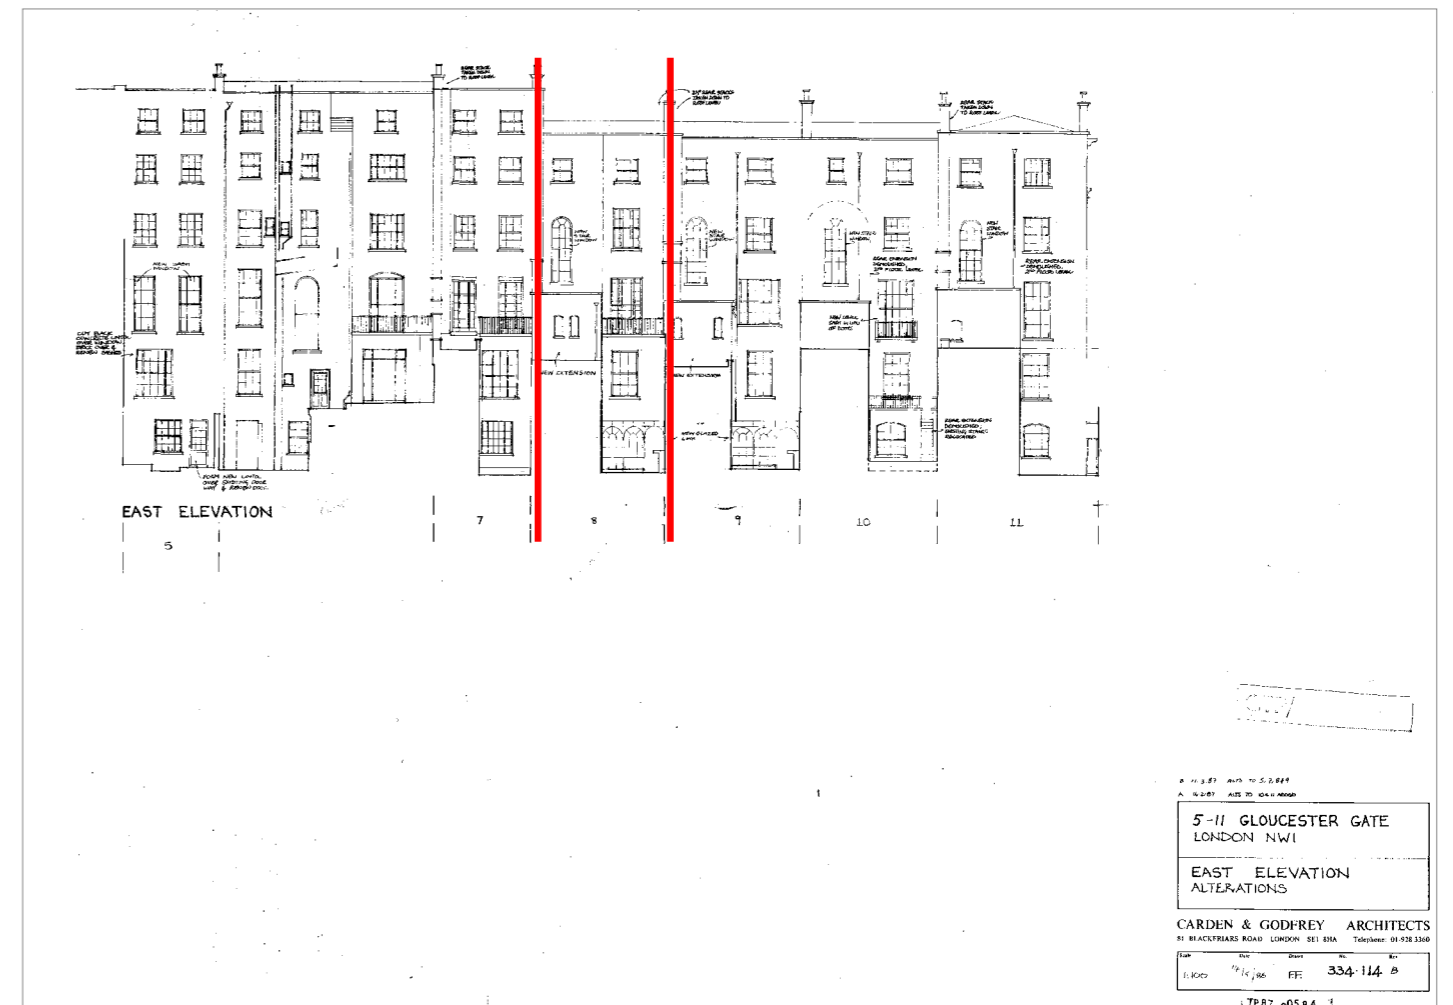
Consented plans for rear elevation at 8 Gloucester Gate, 1987.
